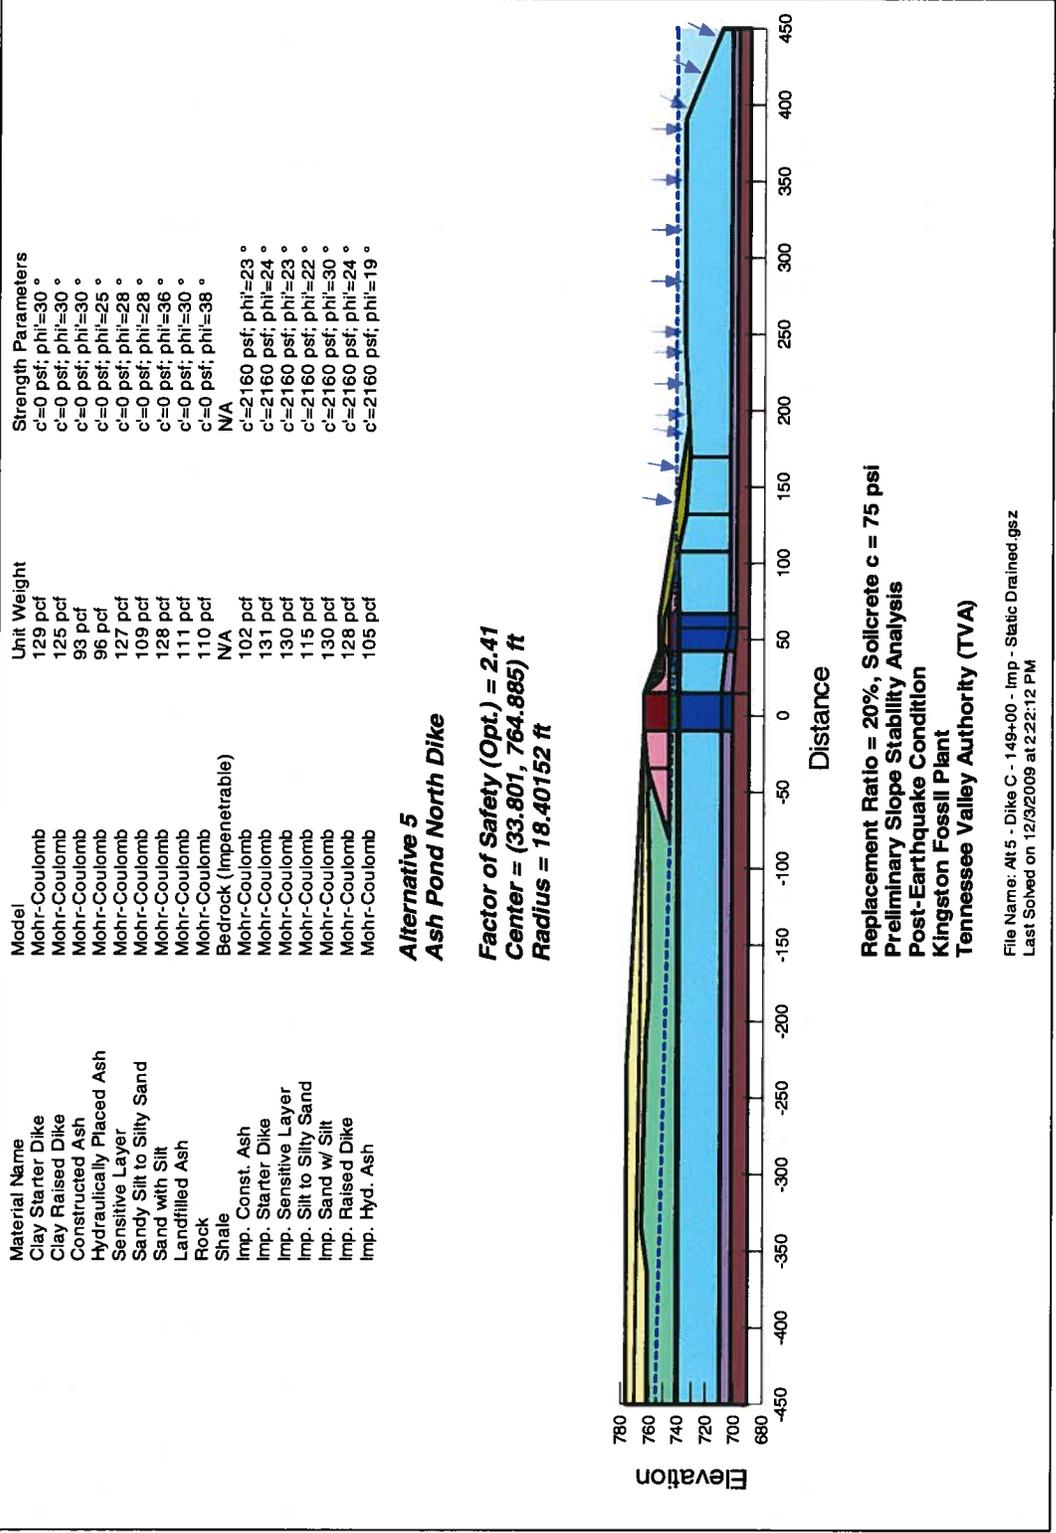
Alternative 5, Ash Pond South Dike C, With Improvement, Static Drained Condition
